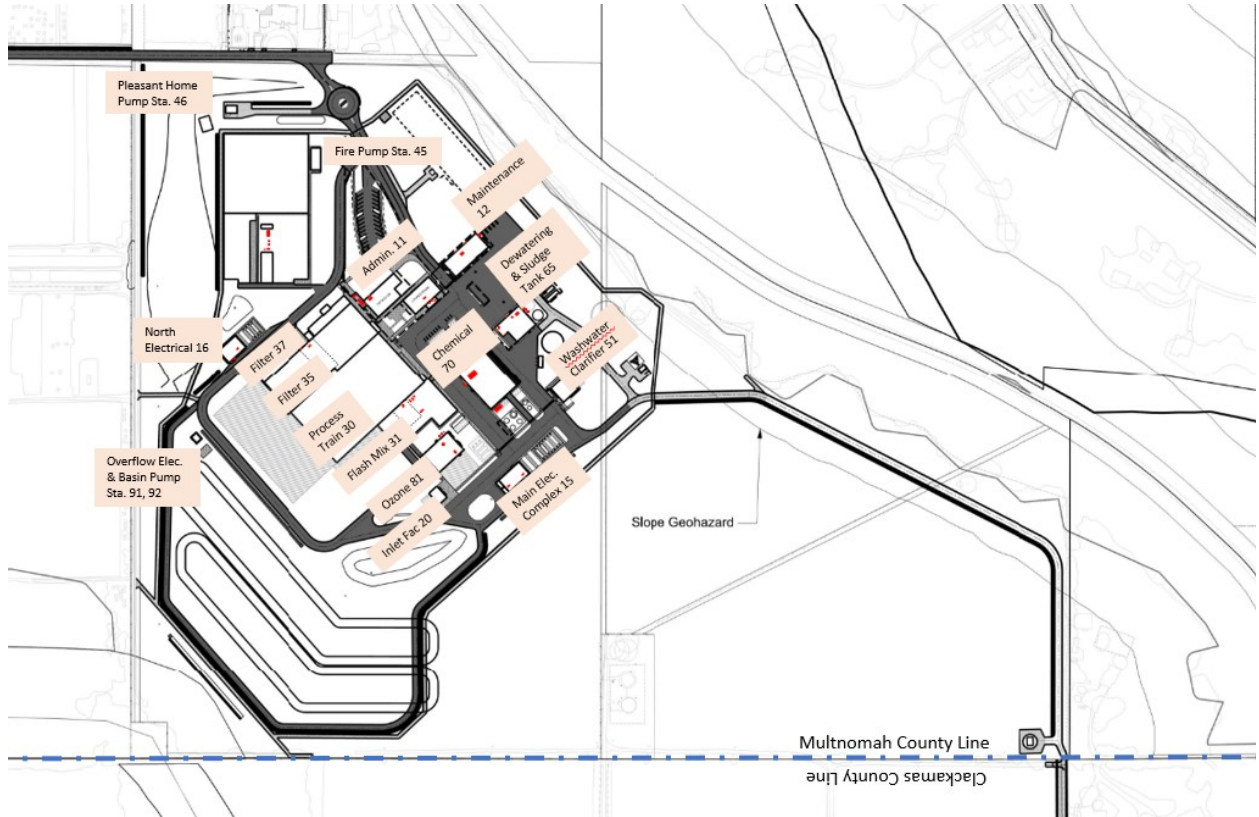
Location of Bull Run Filtration Project Buildings and Structures.
